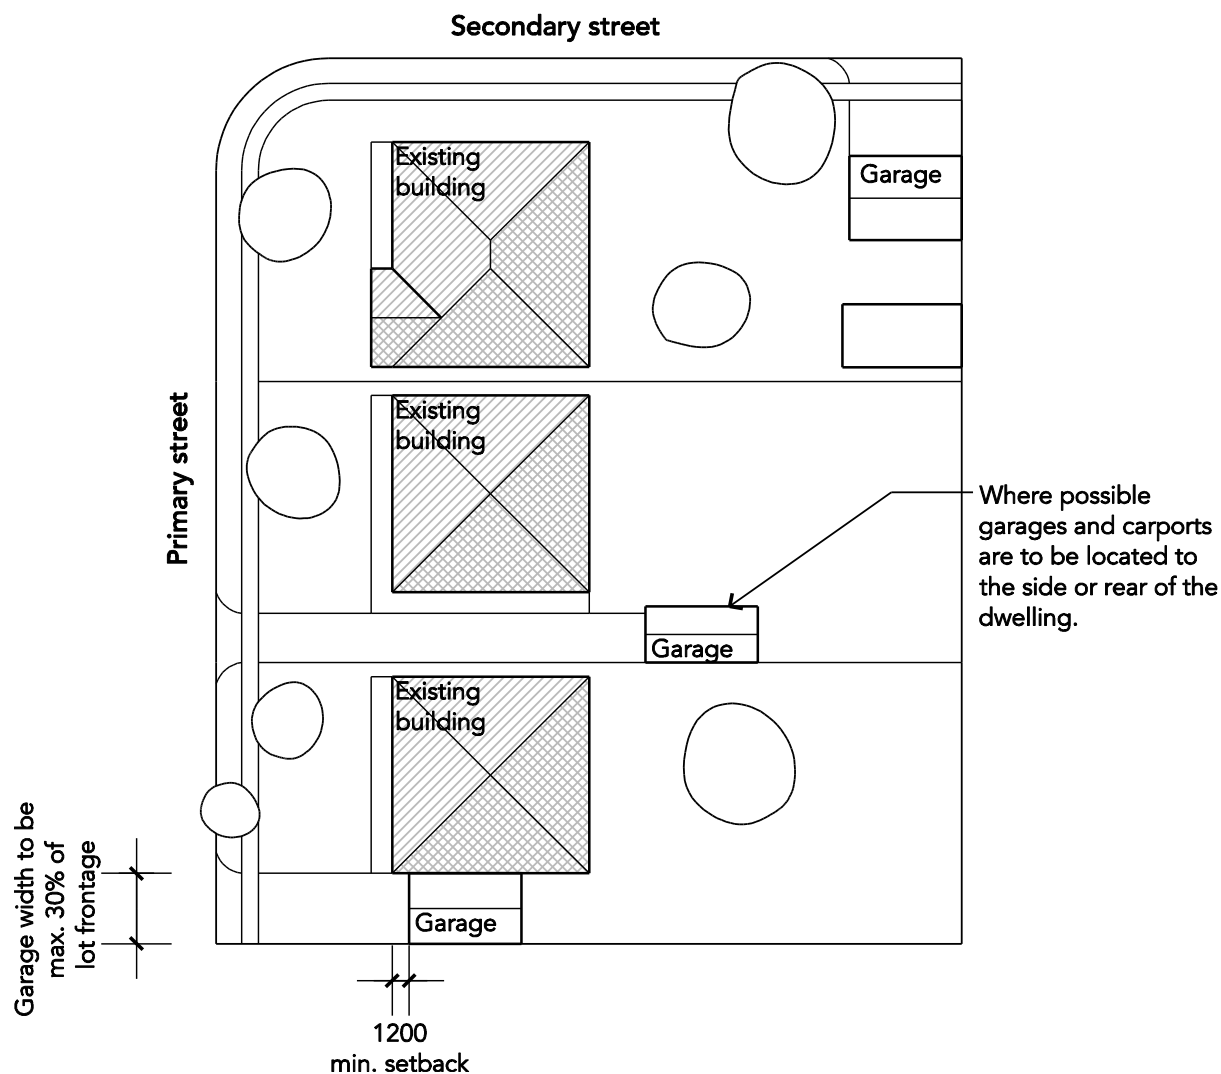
Site plan illustrating compatible garage locations in residential developments – *Griffiths Architects 2012*.
